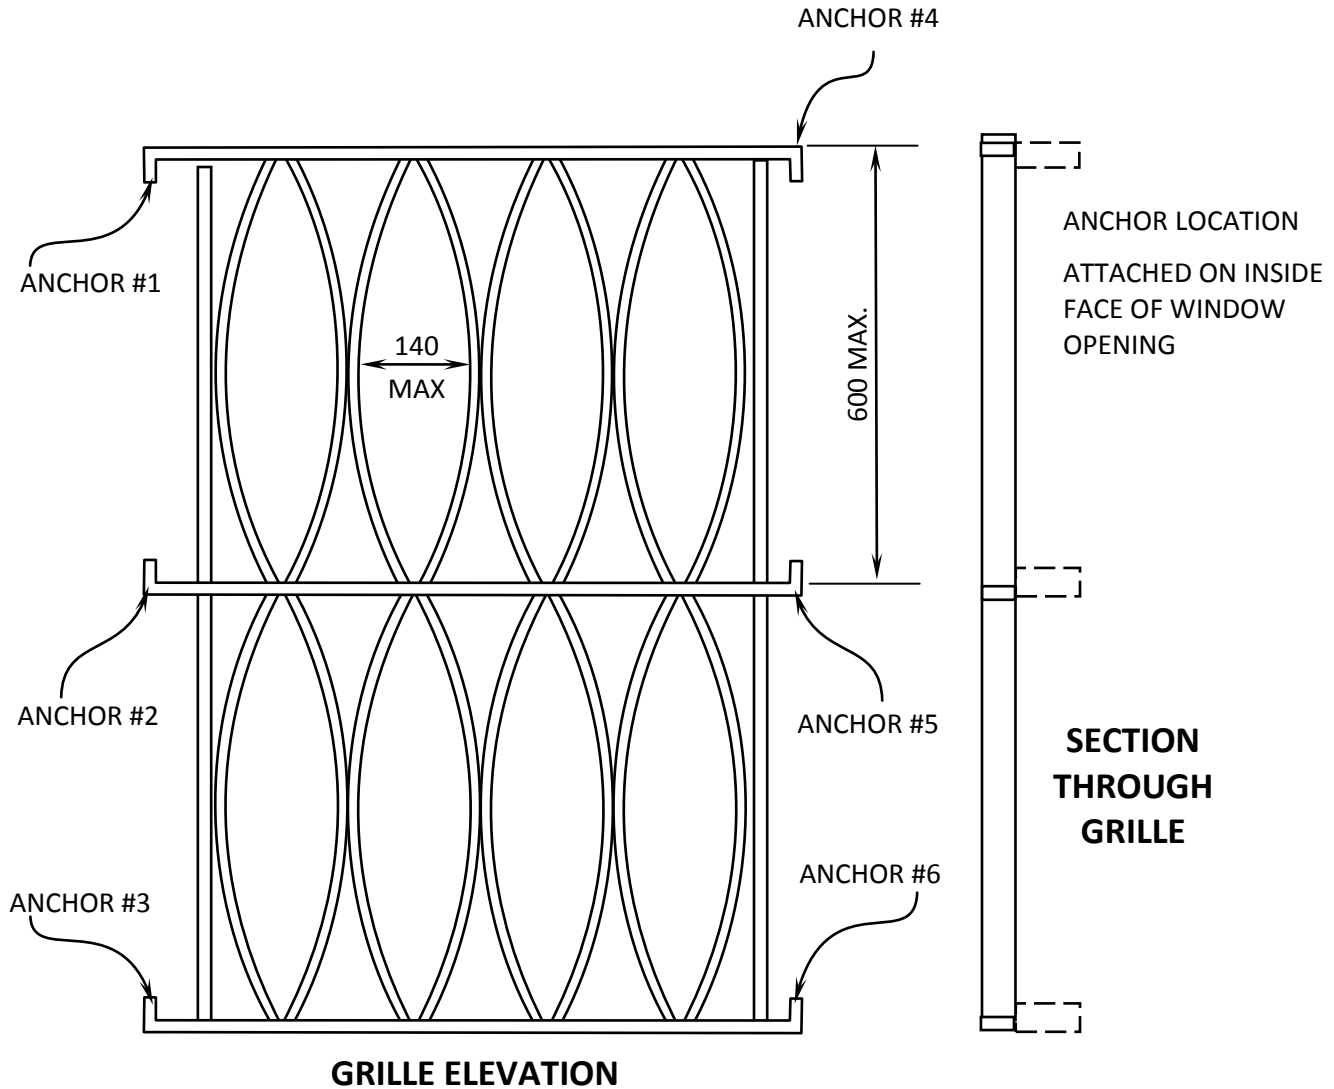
GRILLE WINDOW DESIGN AND DETAILS
